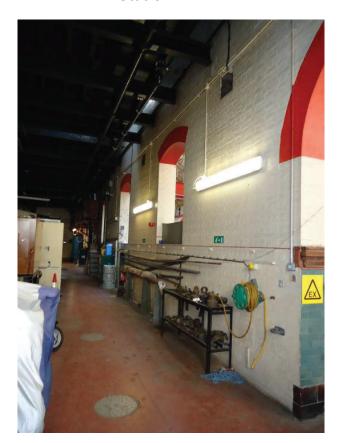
An existing plant cabinet within Lots Road Pumping Station
